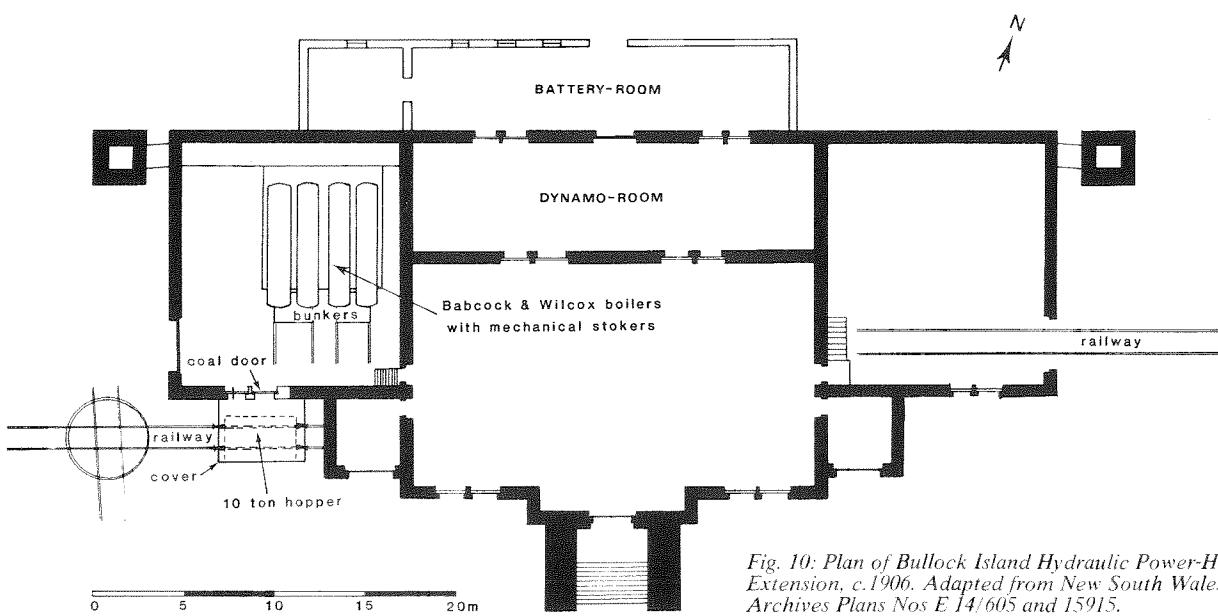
Plan of Bullock Island Hydraulic Power-House, 3rd Extension, c.1906. Adapted from New South Wales Railways Archives Plans Nos E 14/605 and 15915.
